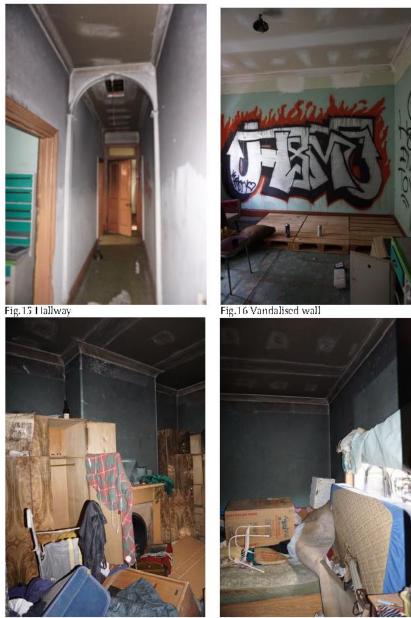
The front room has extensive fire damage Fig. 18 Front room
